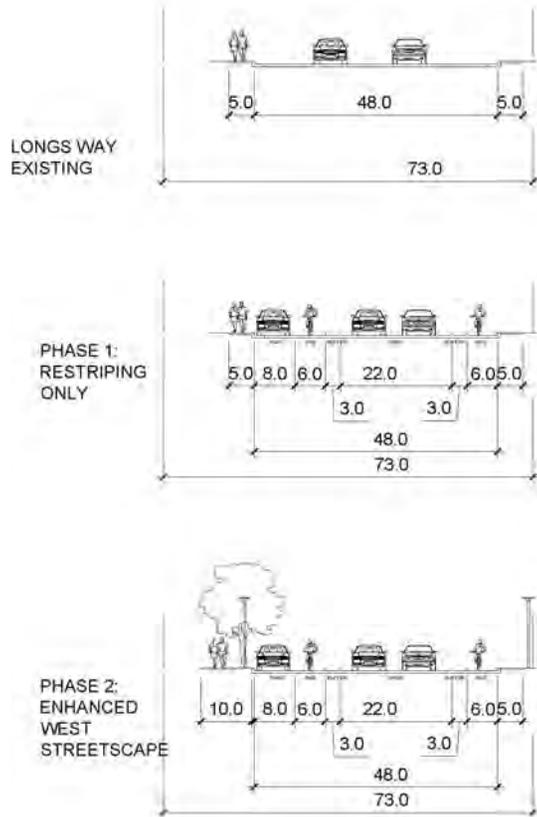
Cross Sections: Longs Way Parker to Senior Center
